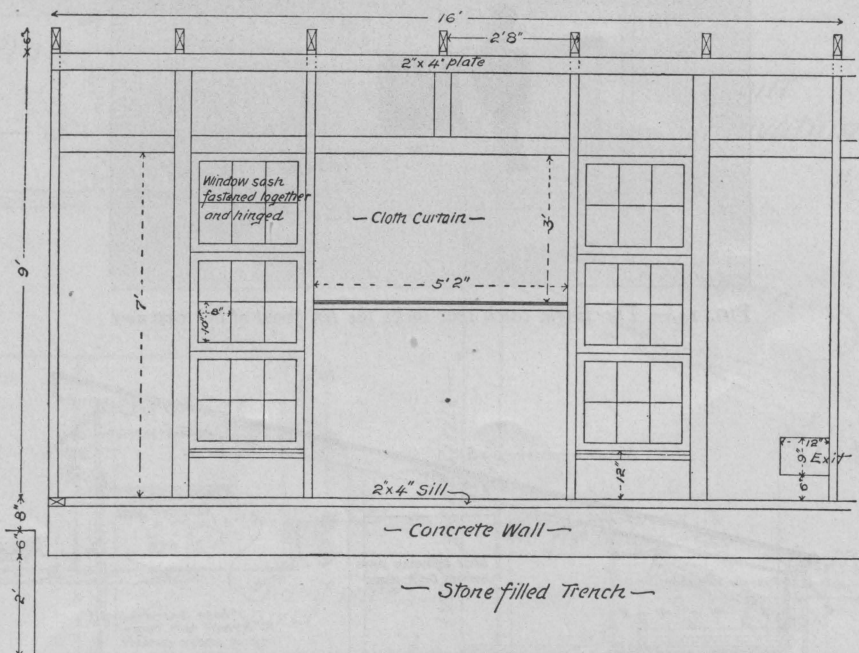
Front elevation of the Cornell poultry house with pens 16 feet square. The window sashes are fastened together and hinged on the side so as to open like a door. Windows not to be used as doors are covered with poultry-wire netting.
